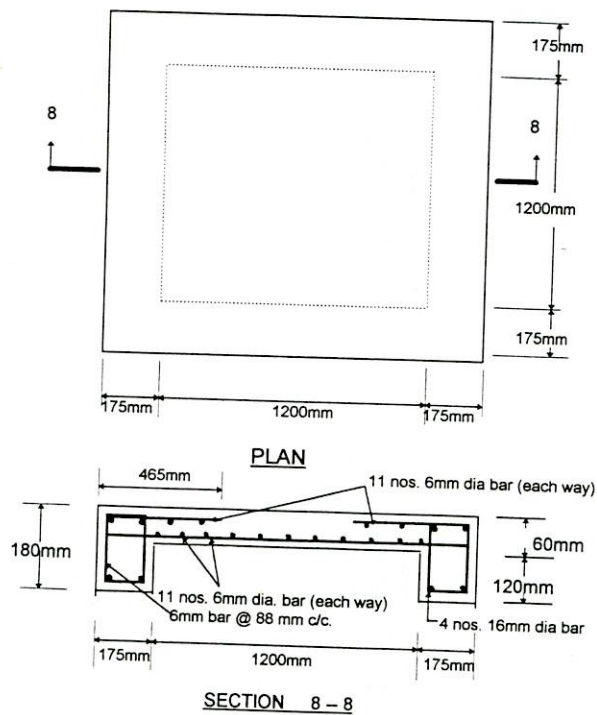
(a) Plan (b) Section and reinforcement details of SLAB8
